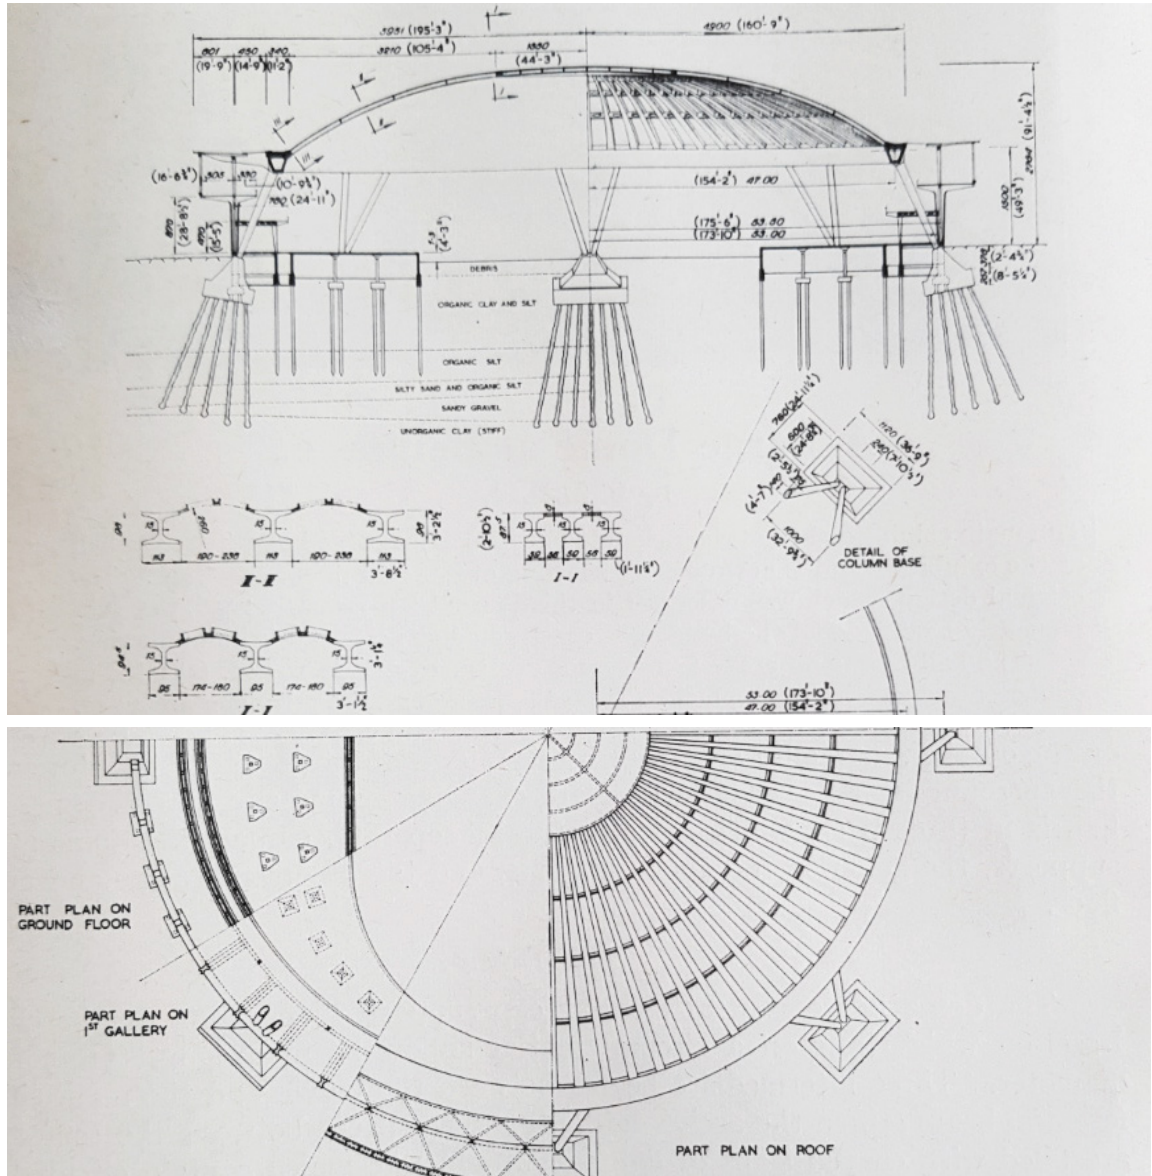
Cross sections of the Hall 1 of the Belgrade Fair (Žeželj, 1960)
